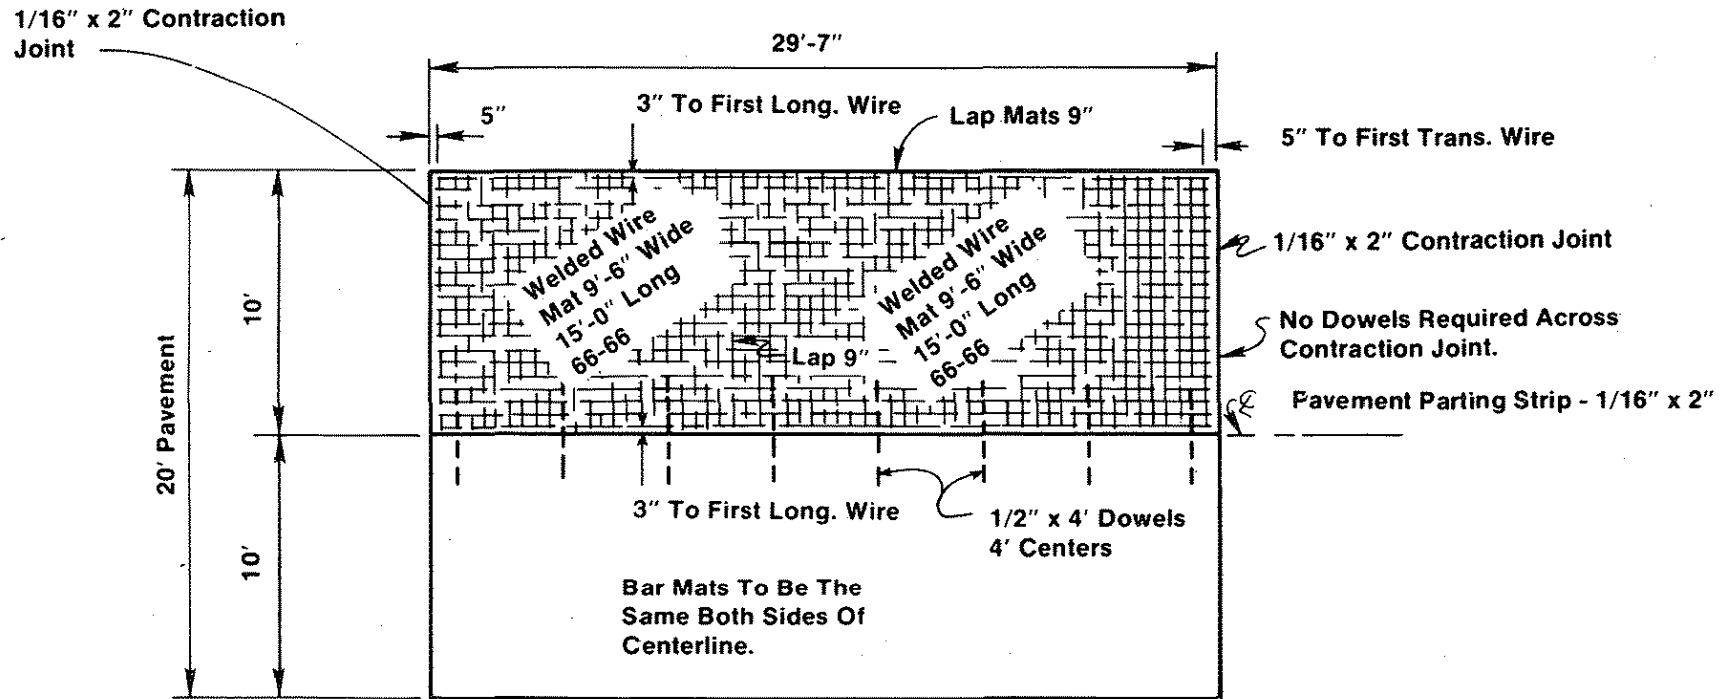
TYPICAL PAVEMENT CONDITION OF THE 4-1/2"
